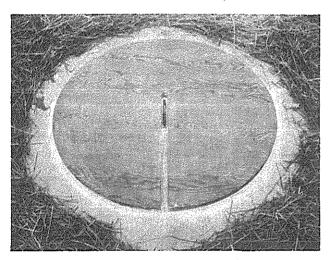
CIRCULAR PLYWOOD BEARING PLATE SEATED ON THE PAVEMENT,
